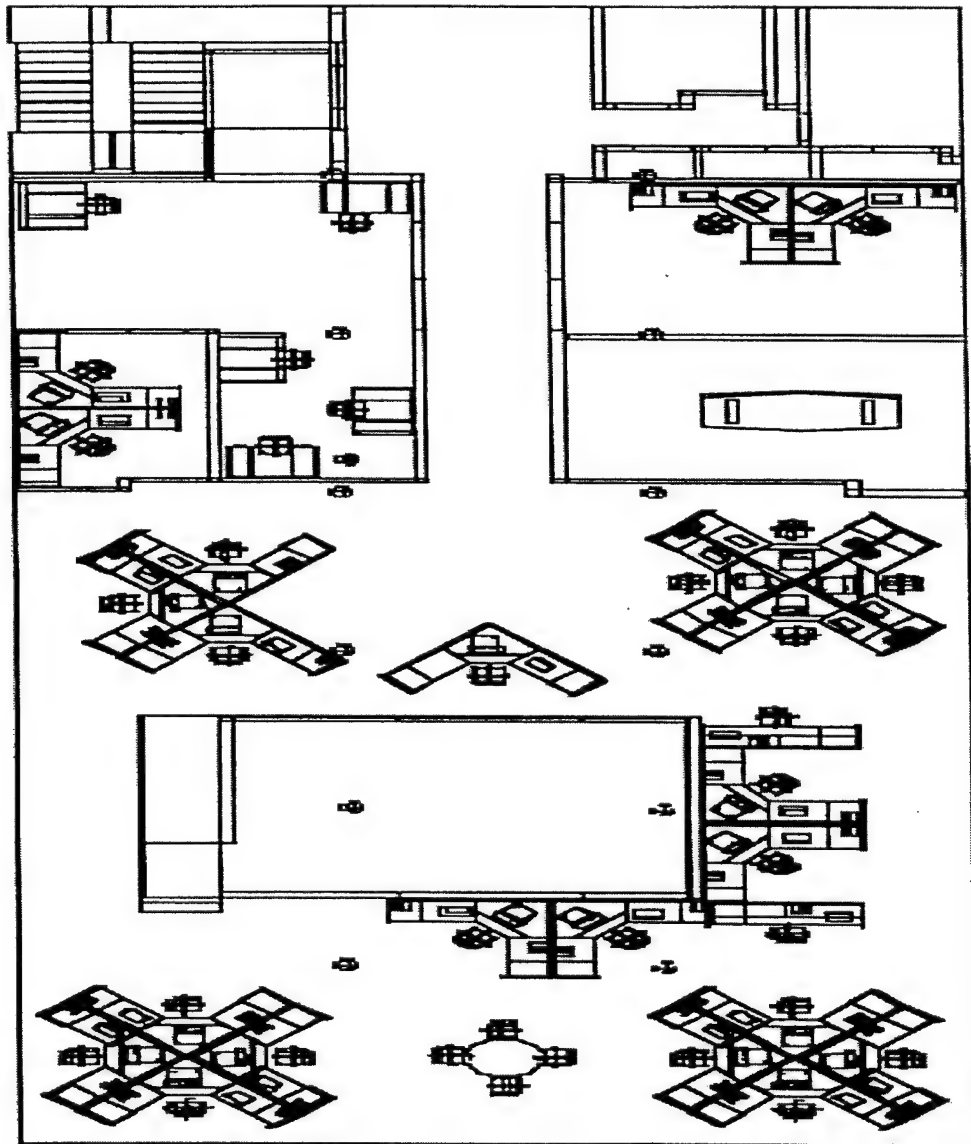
Second Floor Layout: Computer Center & Work Areas
